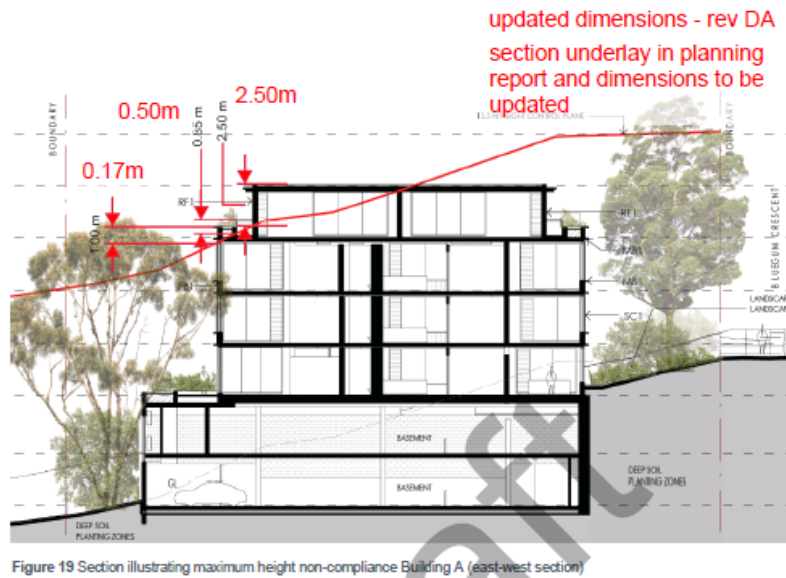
Section illustrating maximum height non-compliance Building A (east-west section) - amended.
